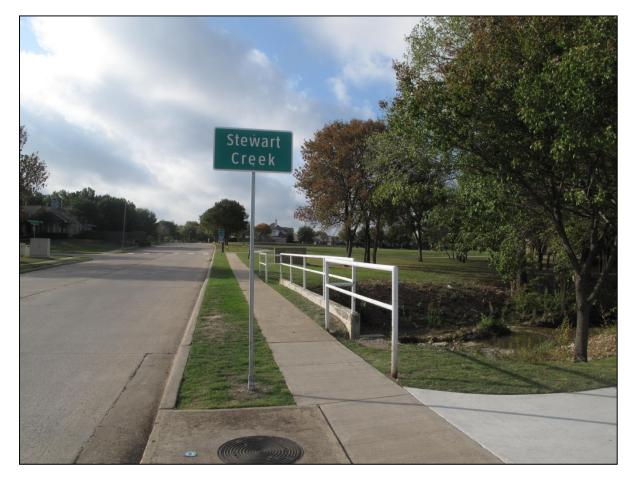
Standing on bridge on Woodstream Dr. looking downstream at the North Tributary.
